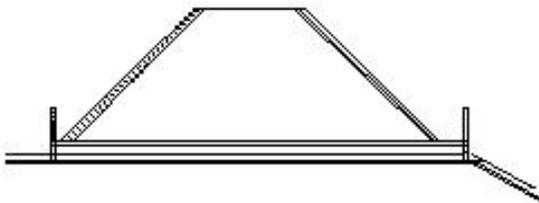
Foundation ground and bottom gutter longitudinal plan
